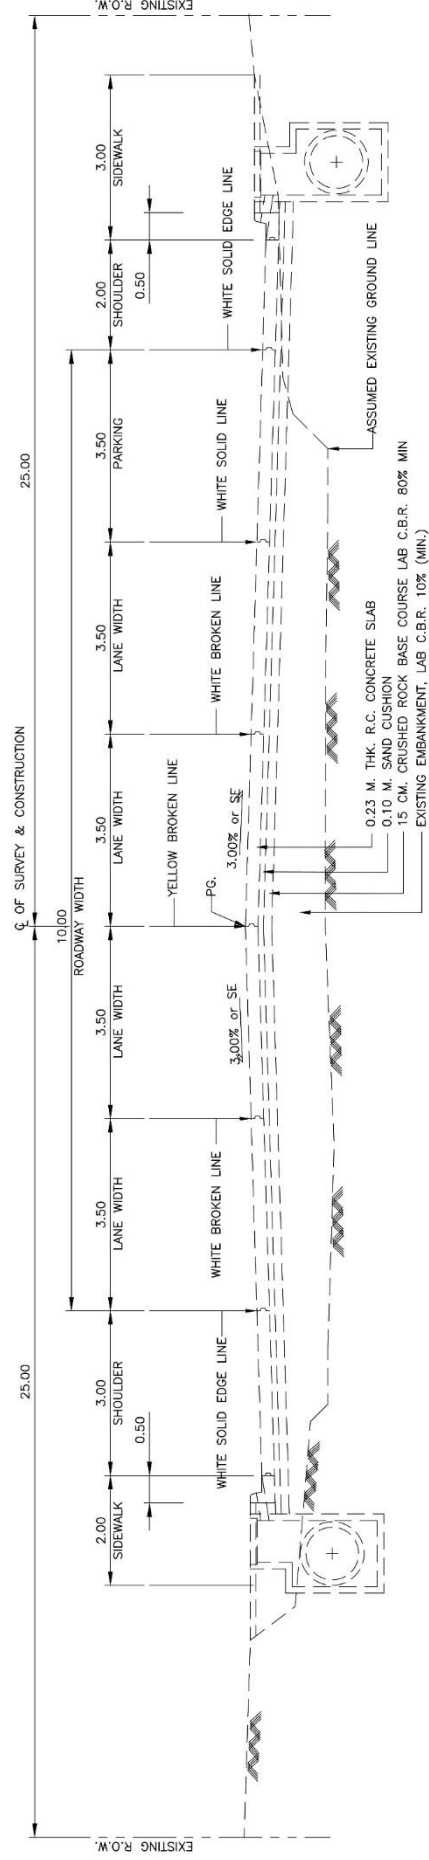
Typical Section of Sta. 56+900 - Sta. 57+300
